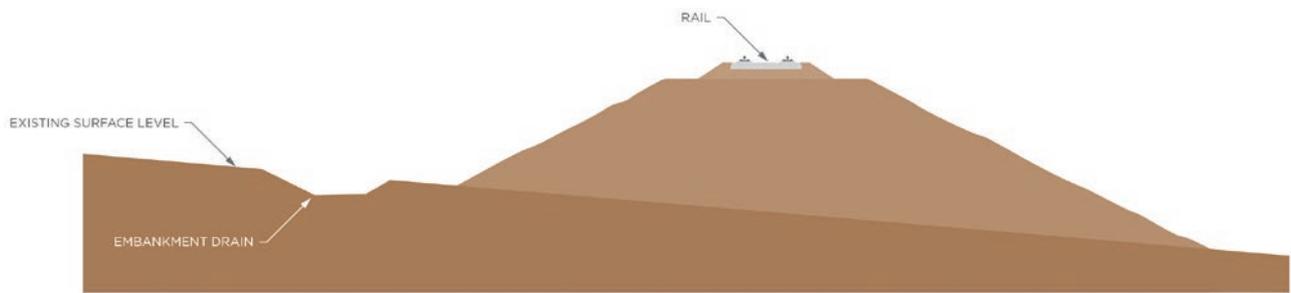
TYPICAL LONGITUDINAL DRAINAGE FOR RAIL FORMATION ON TOP OF AN EMBANKMENT
